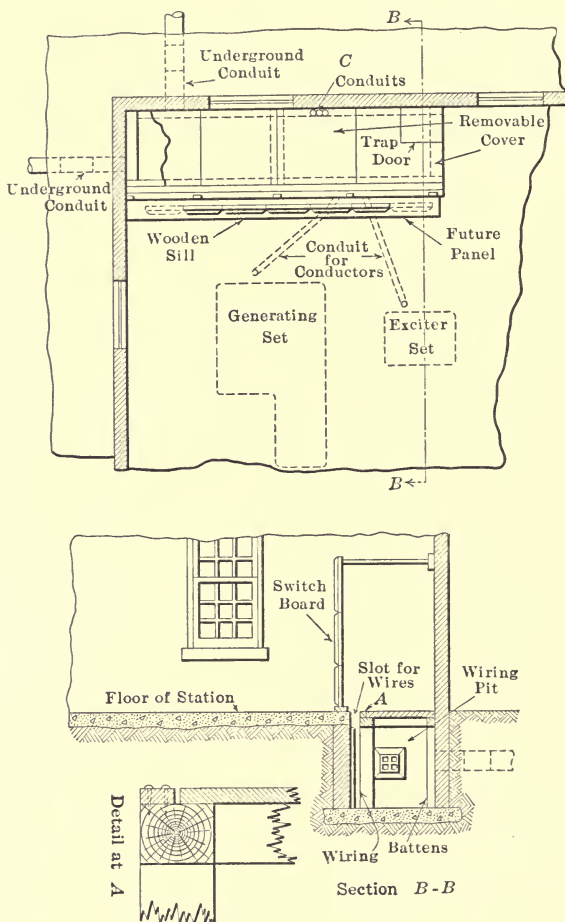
WIRING PIT BACK OF SWITCHBOARD.
